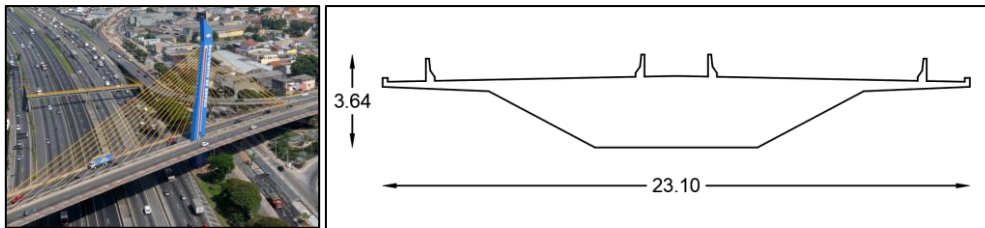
Viaduct Cidade de Guarulhos. Cross section.
